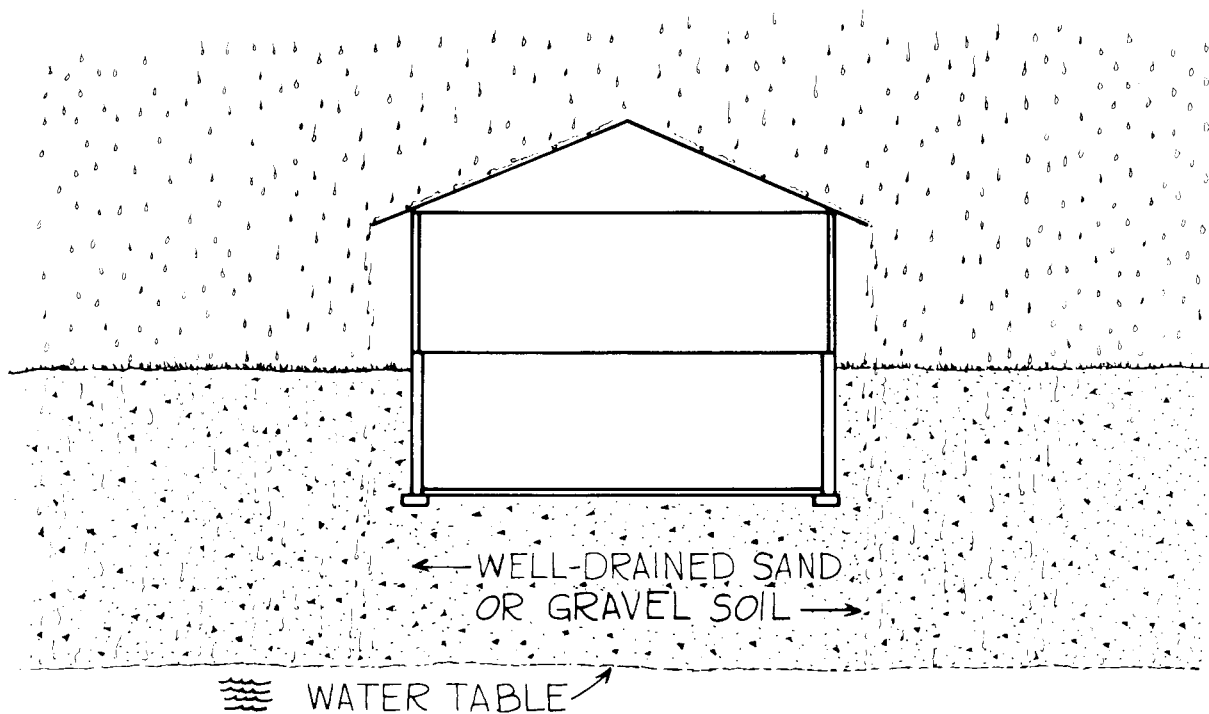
Foundation built in well-drained soil is not likely to leak.
